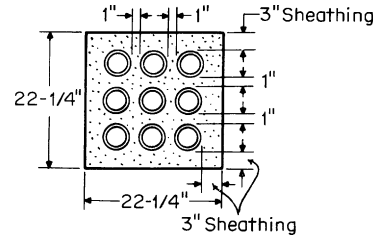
Arrangement of conduit with concrete sheath.
